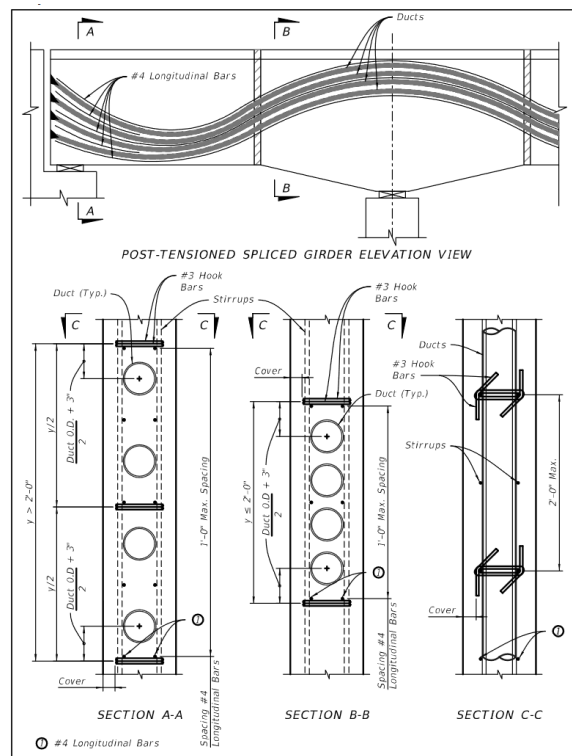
Duct reinforcement for I-girders containing post-tensioning ducts as required by FDOT SDG (Structures Design Guidelines, 2021).
